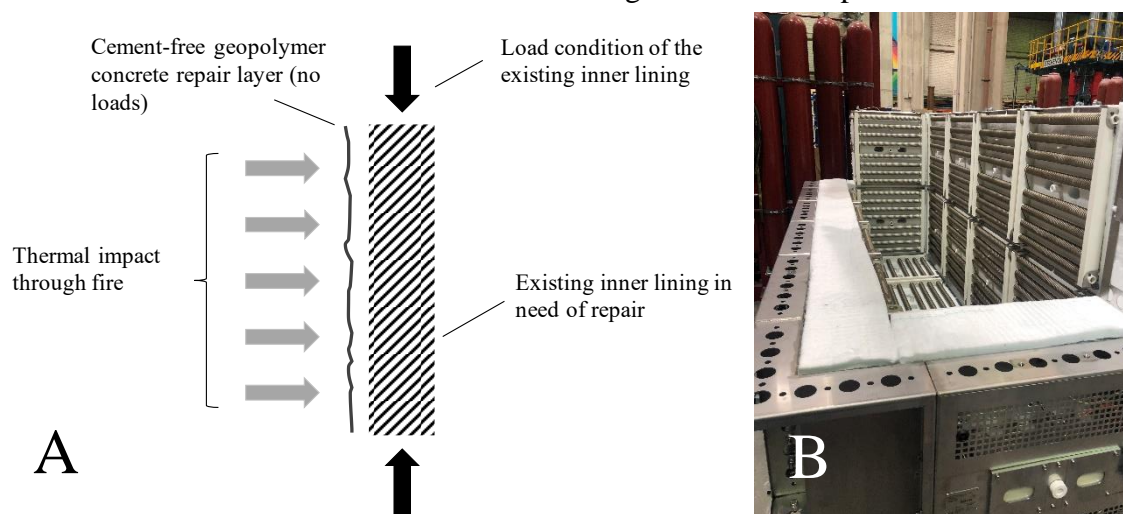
A: Load situation of a coated tunnel inner shell in case of fire | B: Erection of the modular furnace for large-scale tests at RUB laboratories
